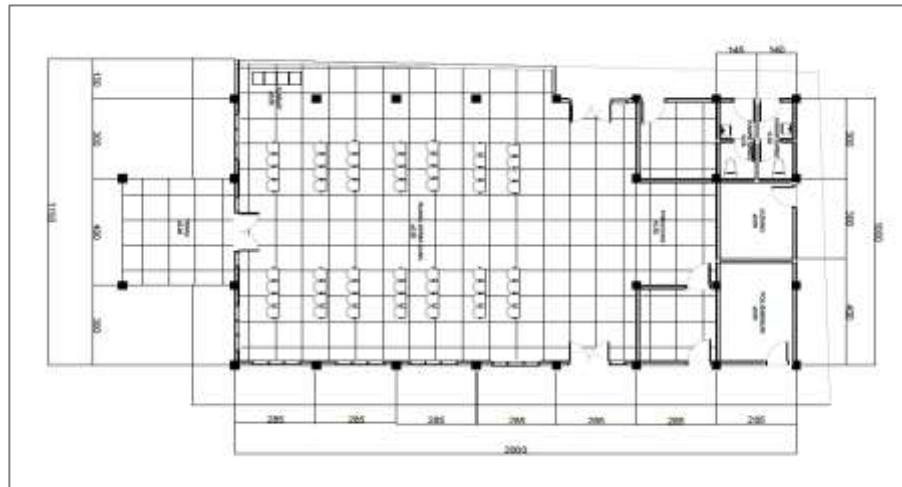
Renovation Floor Plan for Petompon Sub-district Hall, Semarang City
